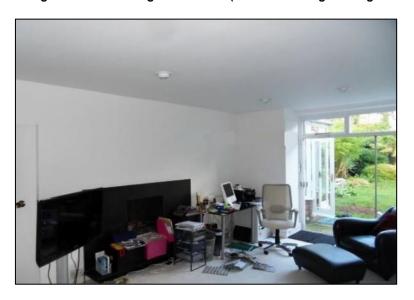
Fireplace in hearth (left) within the living room of 84b (Gemini Building & Design Consultancy)
